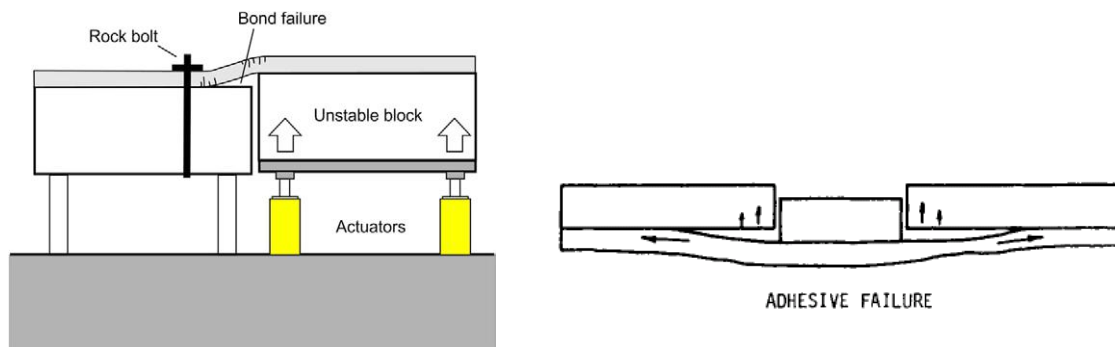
a) Adhesive failure in falling block test used by Holmgren (1987) to assess shotcrete lining capacity, and b) Fernandez-Delgado et al (1975) tests to assess shotcrete lining capacity.
